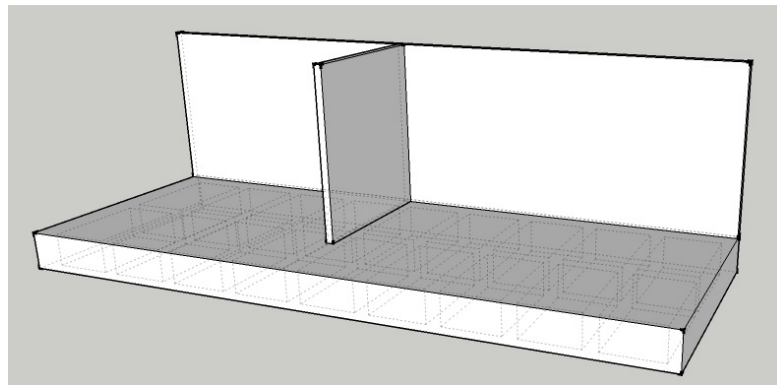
Initial Slab Design with Tilt-Slab Walls
